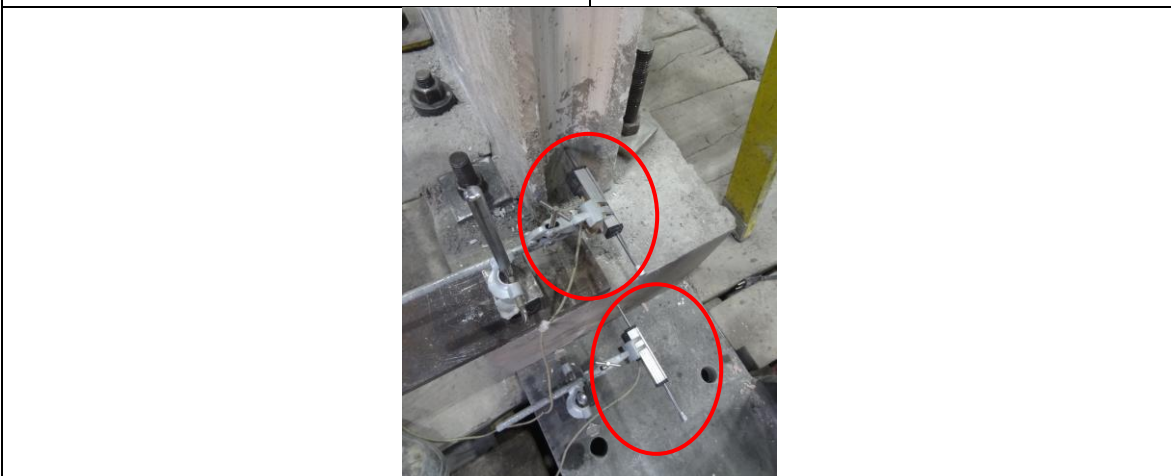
Equipment used for the horizontal load test.
